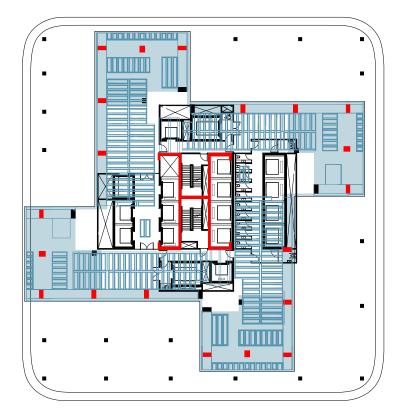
Structural overlay showing the extent of existing slab and structure retained with central expanded core layout
